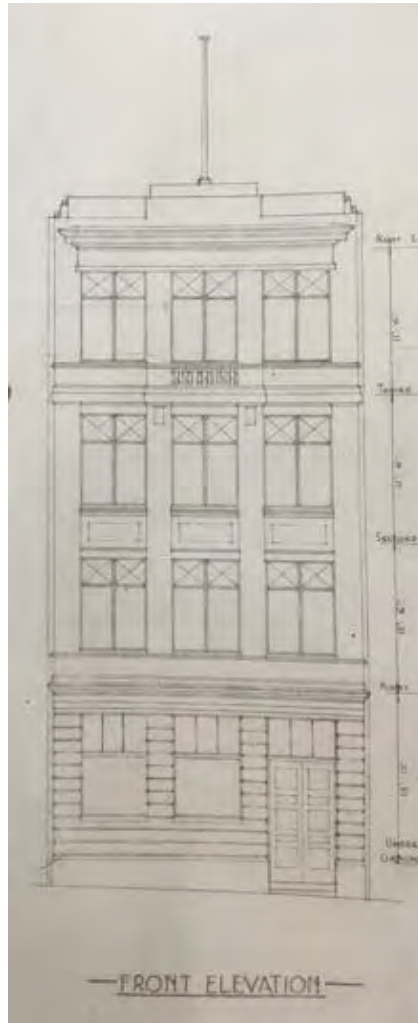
Original building plan showing front elevation of the subject property, with a frontage to Bourke Street. (Source: PROV VPRS 11201/P1 unit 99, item 7871)
